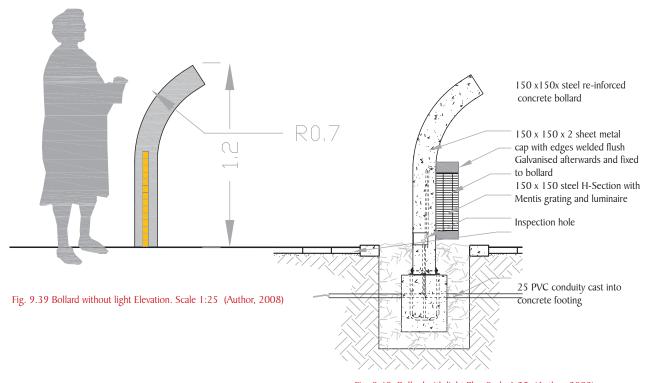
Bollard with light Plan Scale 1:25 (Author, 2008)
